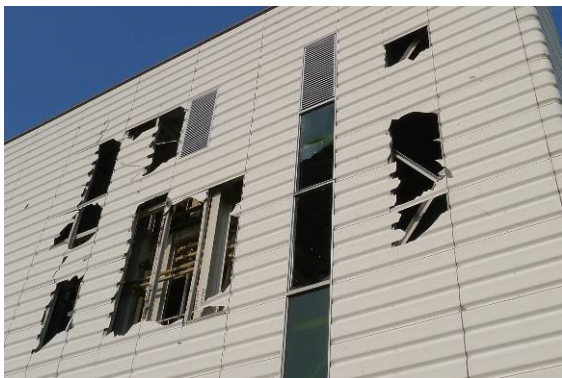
Breakage of exterior and windows Photo 41 Breakage of eave soffits
